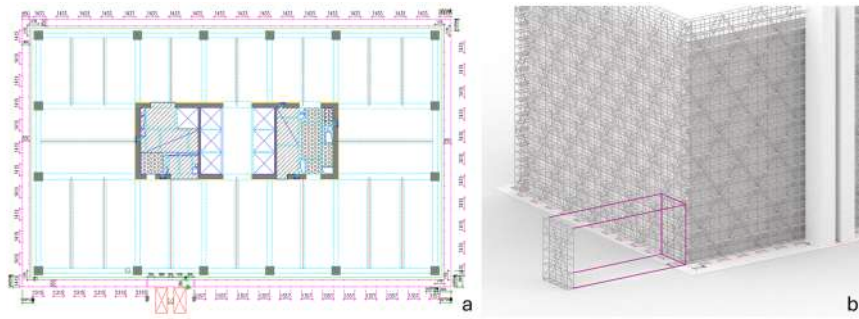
Case site information (a) Building plan with scaffolding scheme. (b) Module of the scaffolding scheme.
